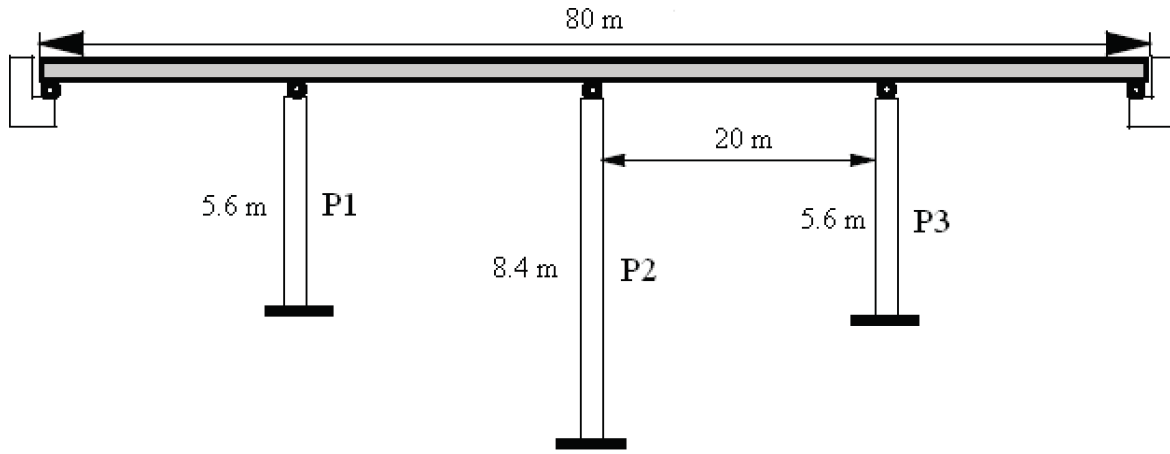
Viaduct: plan view (scale 1:2.5) [PVP+96].
